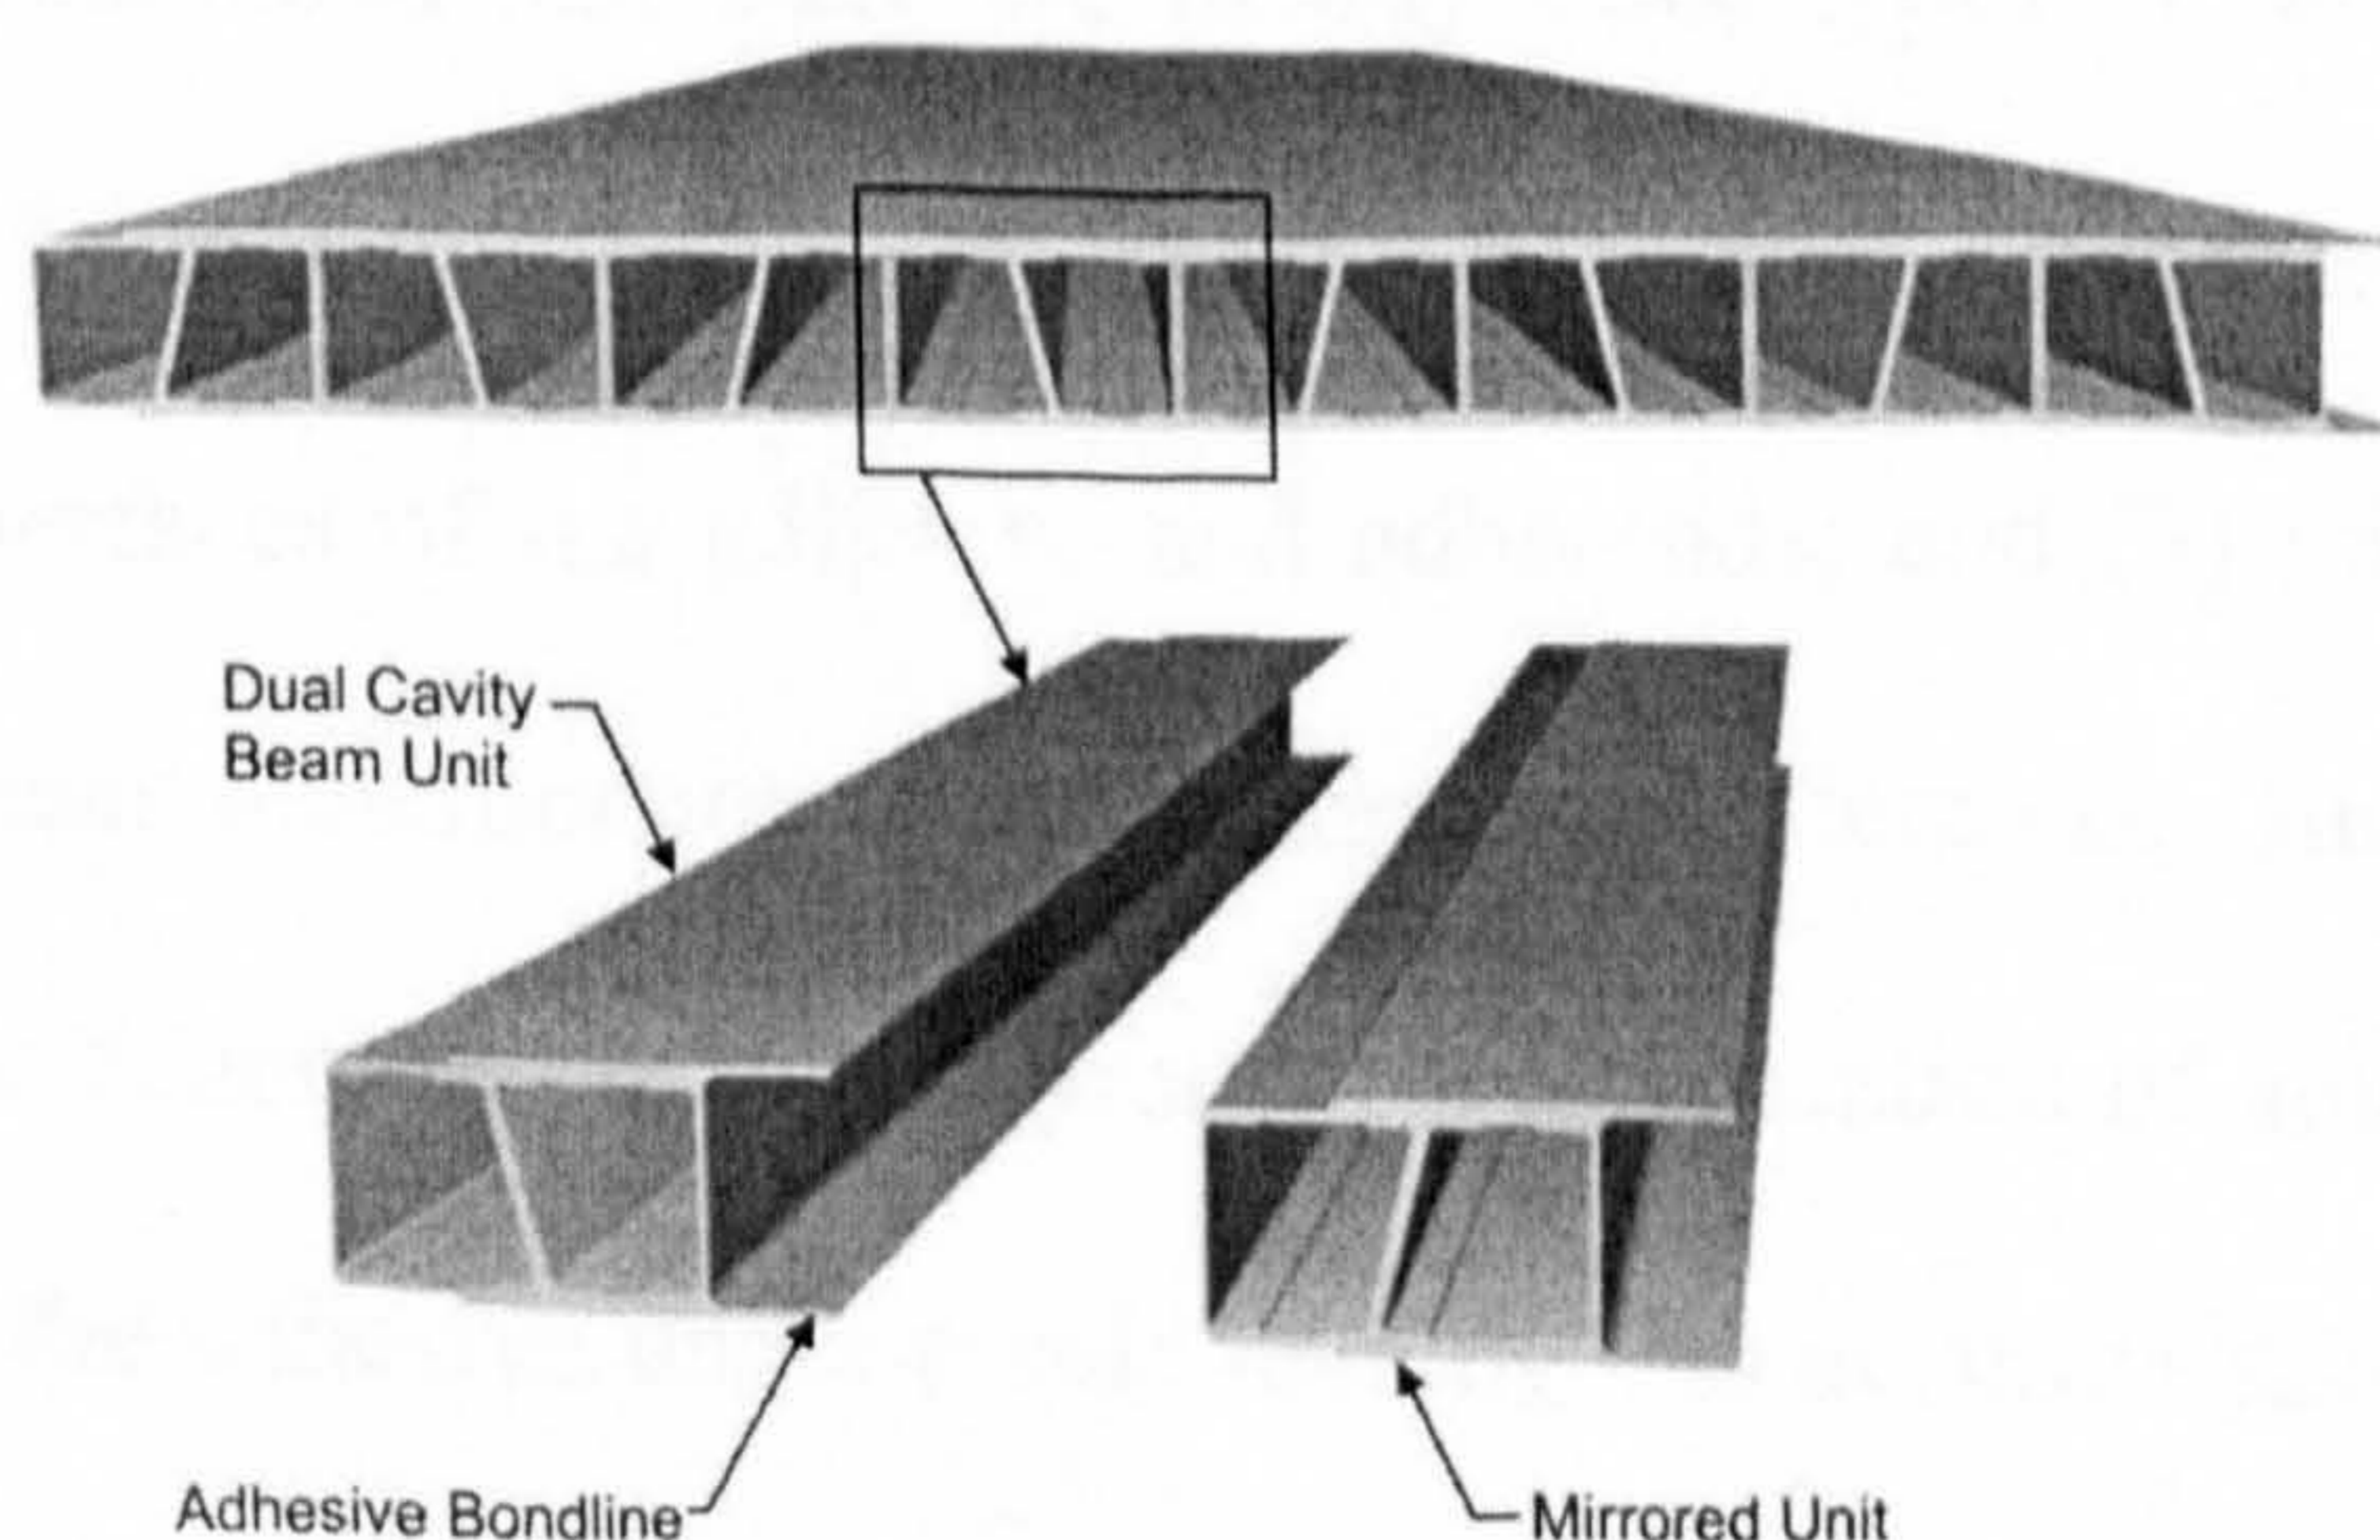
Schematic of the pultruded GFRP bridge deck
